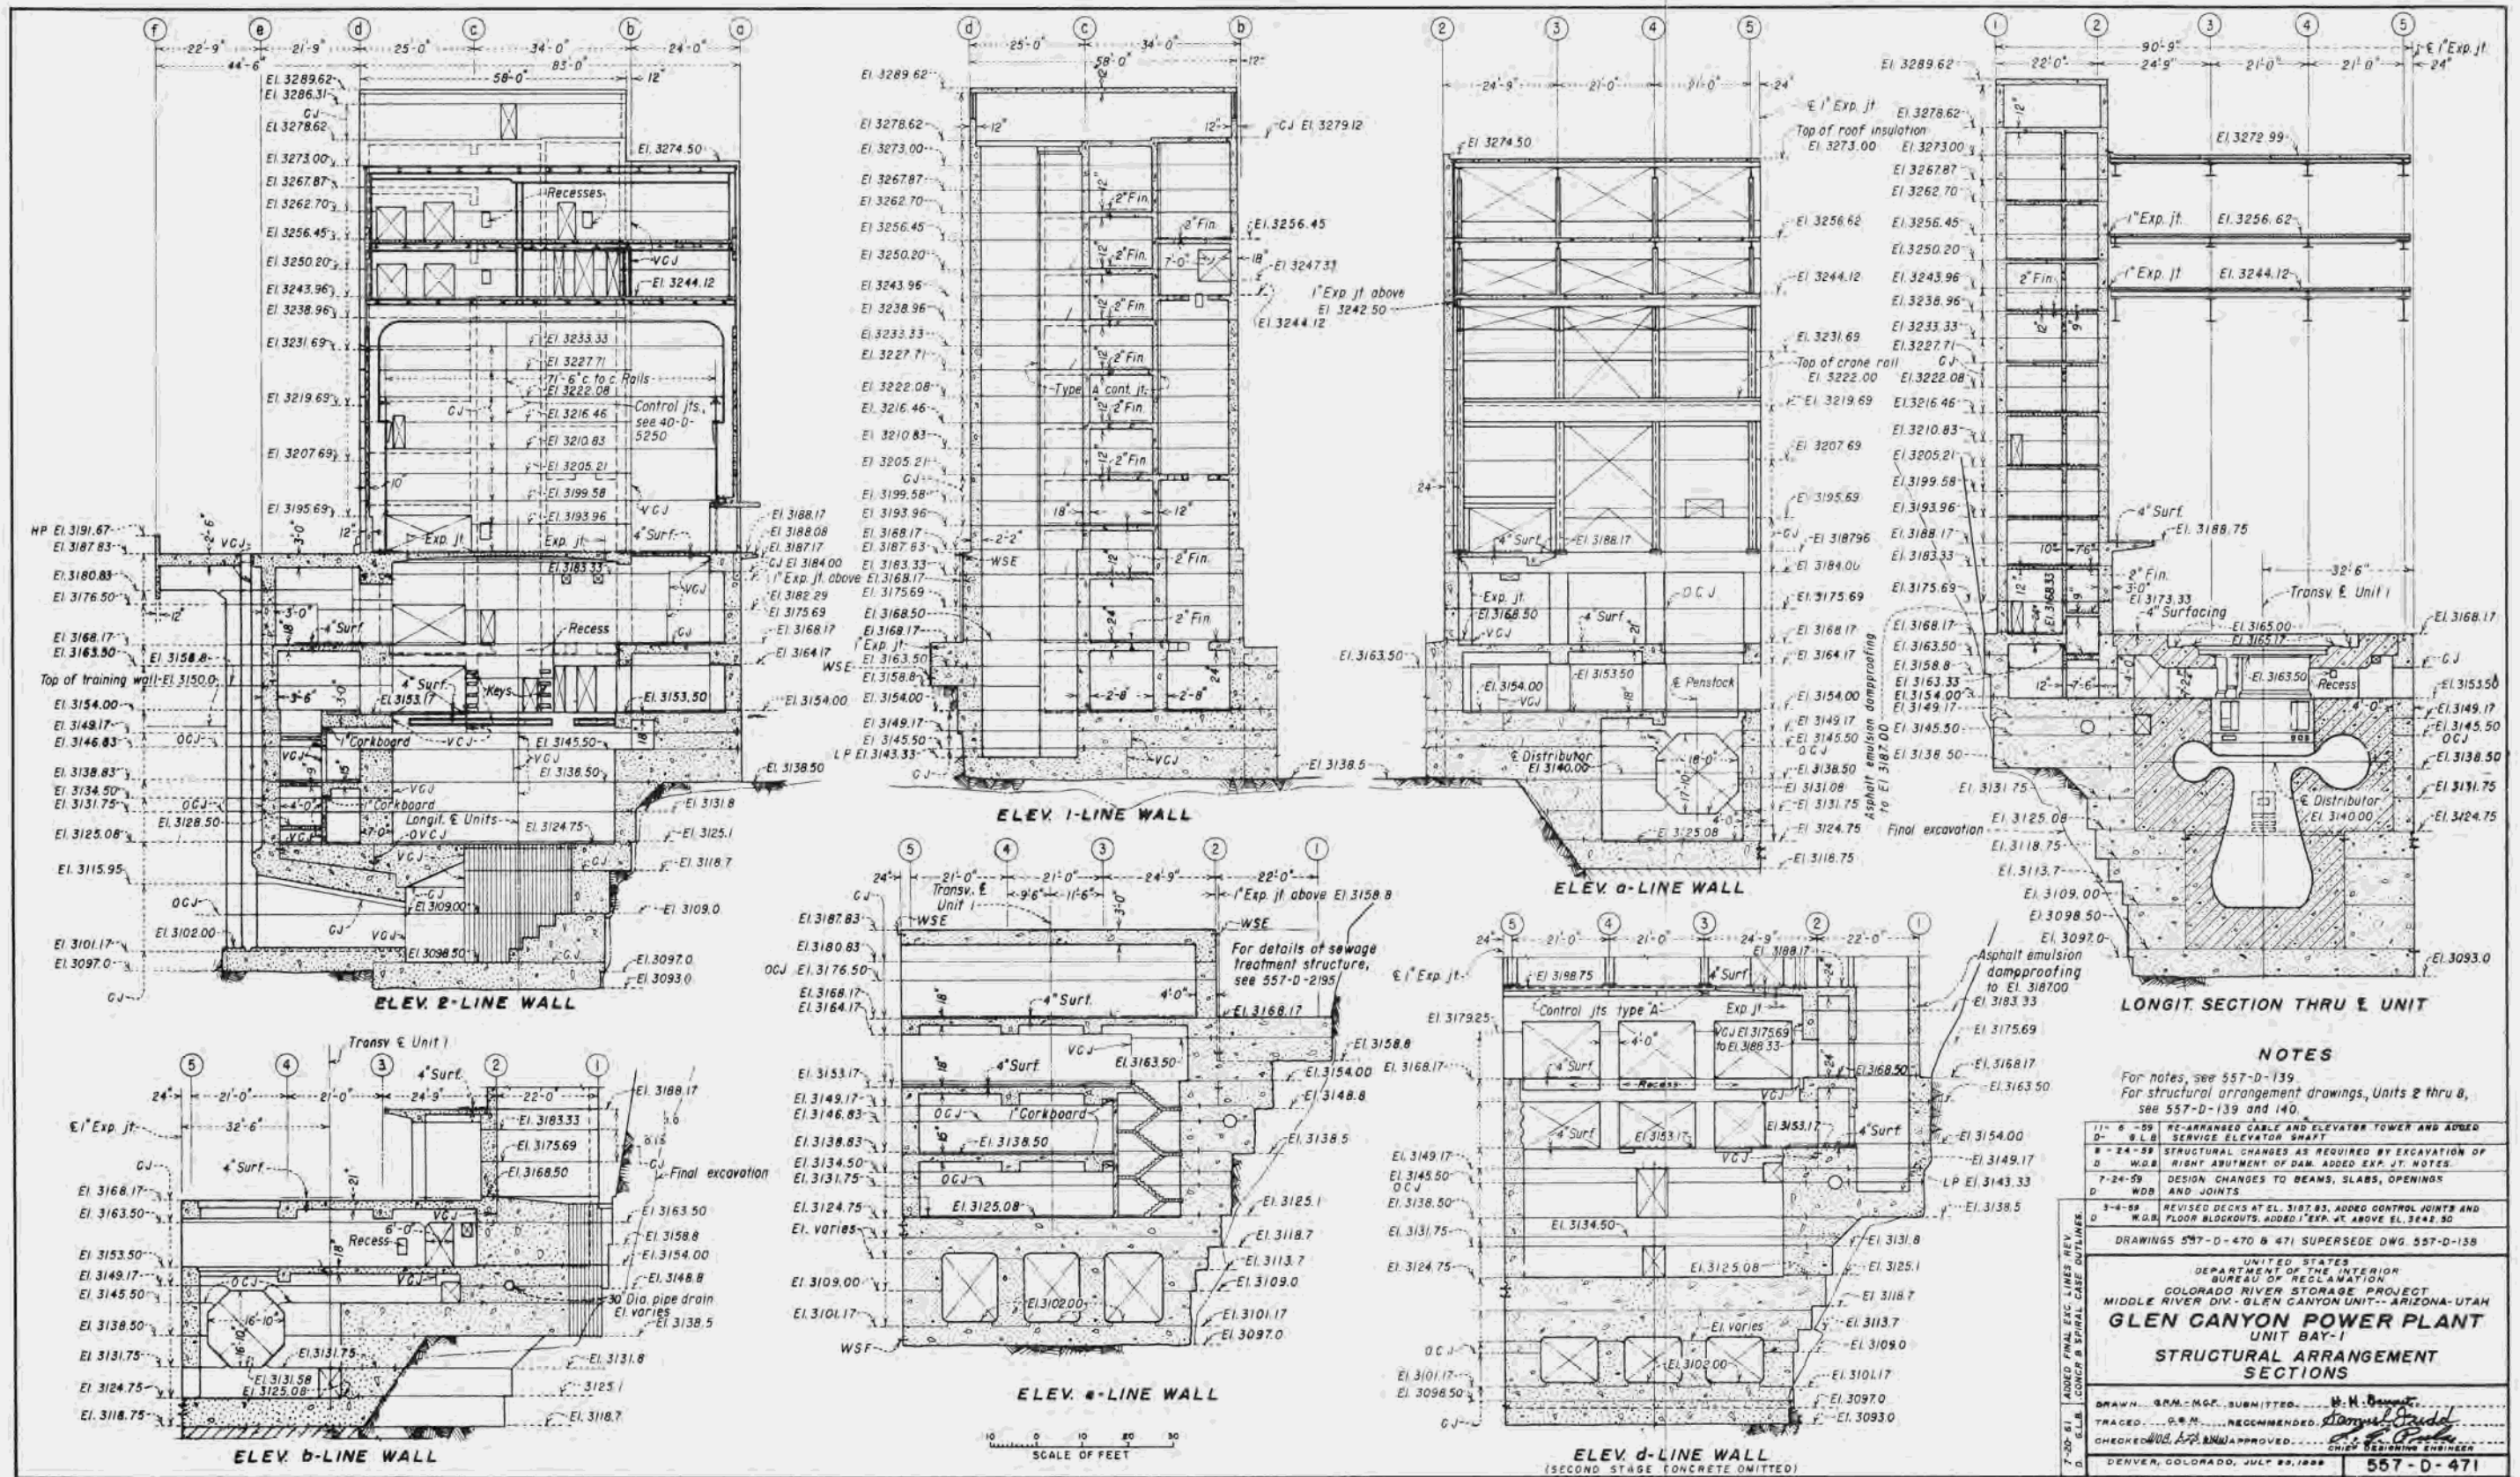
Powerplant structural arrangement sections—Unit bay 1.
